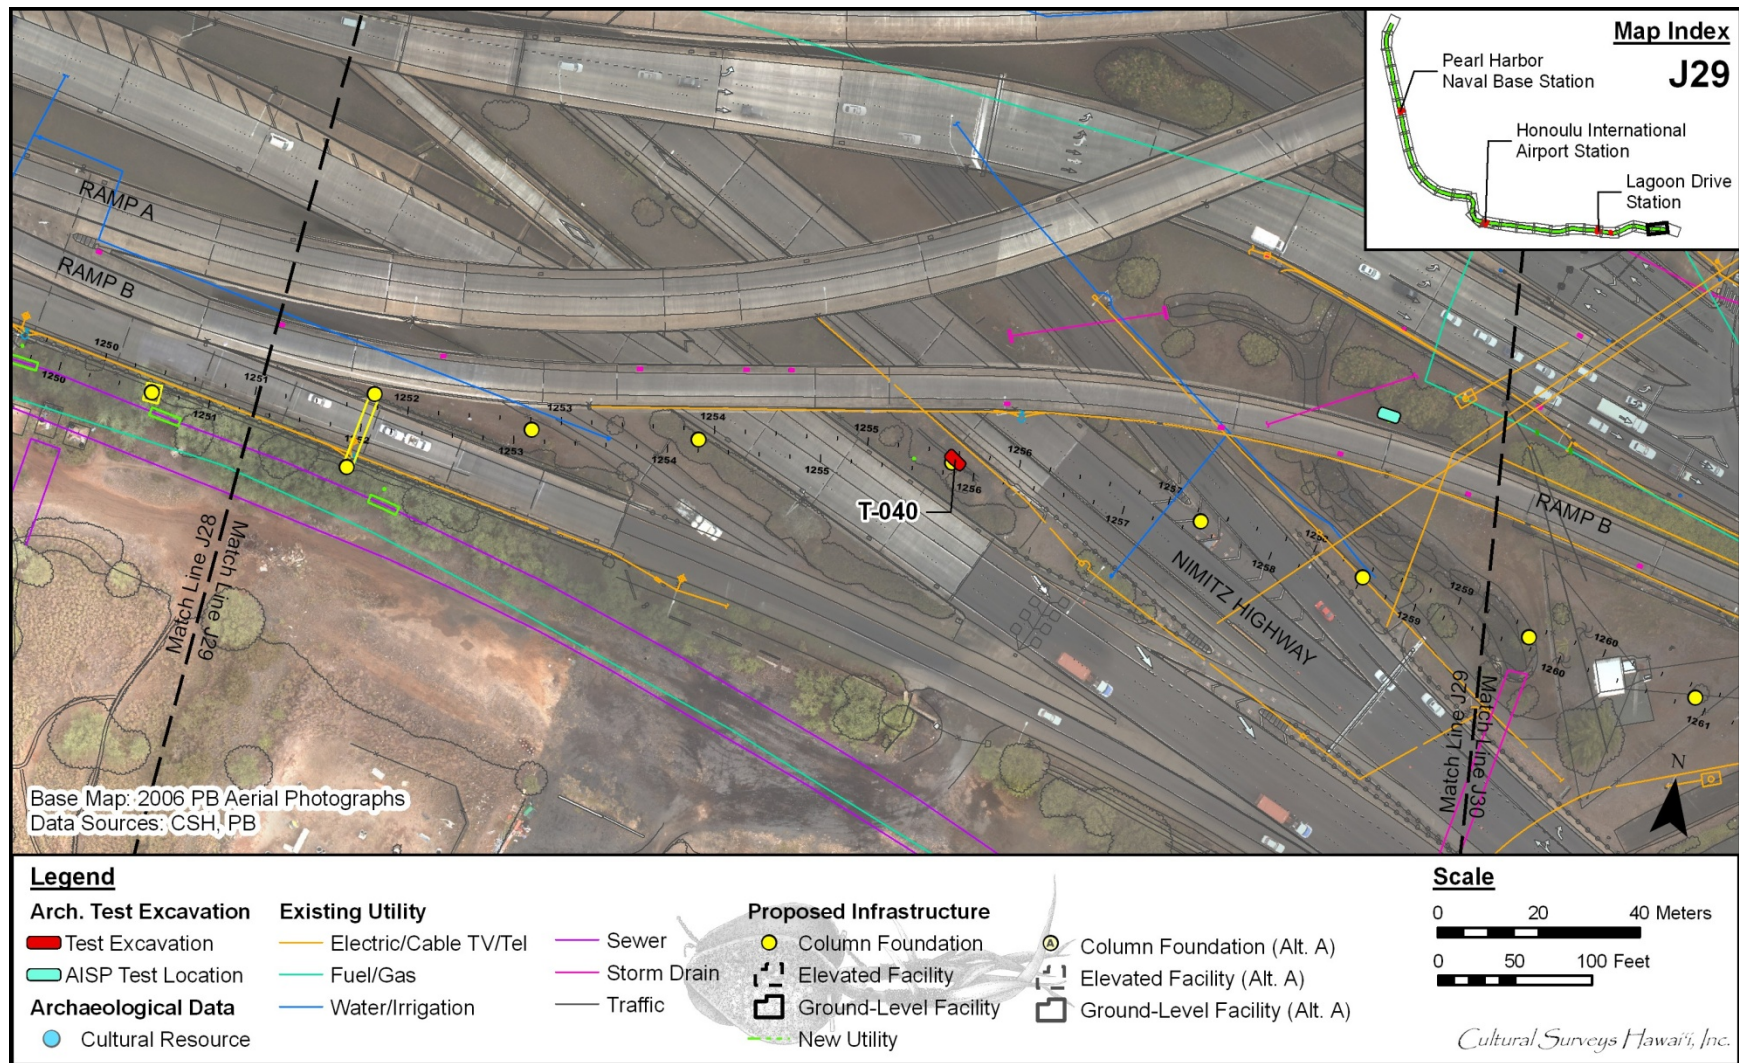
Map Sheet J29, one test excavation (T-040) at column foundation @ 1247+50
